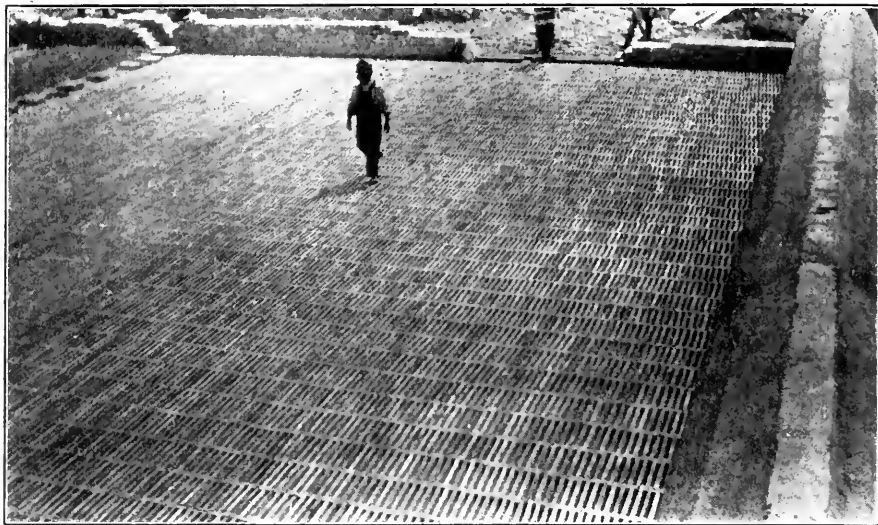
FILTER FLOOR BEFORE PLACING BROKEN STONE.
